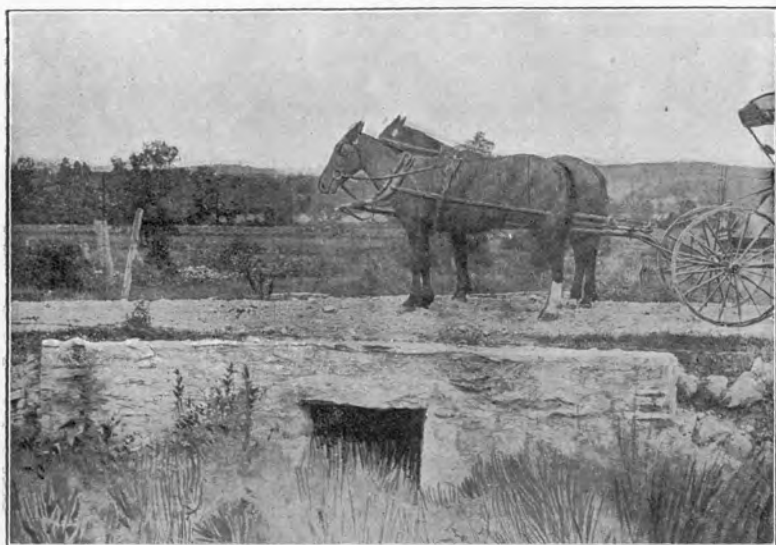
^{3/4} Good permanent stone culvert in the town of Wabeka, Washington county.
